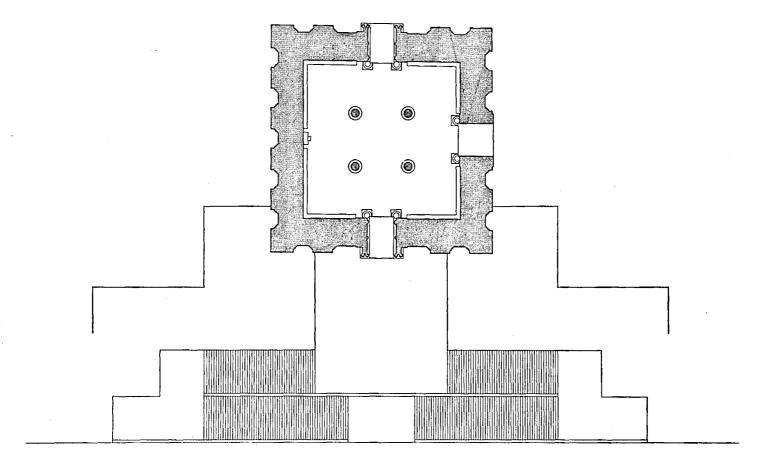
Reconstructed Plan of Terrace Stairway and Gate of Xerxes. Scale, 1:600
